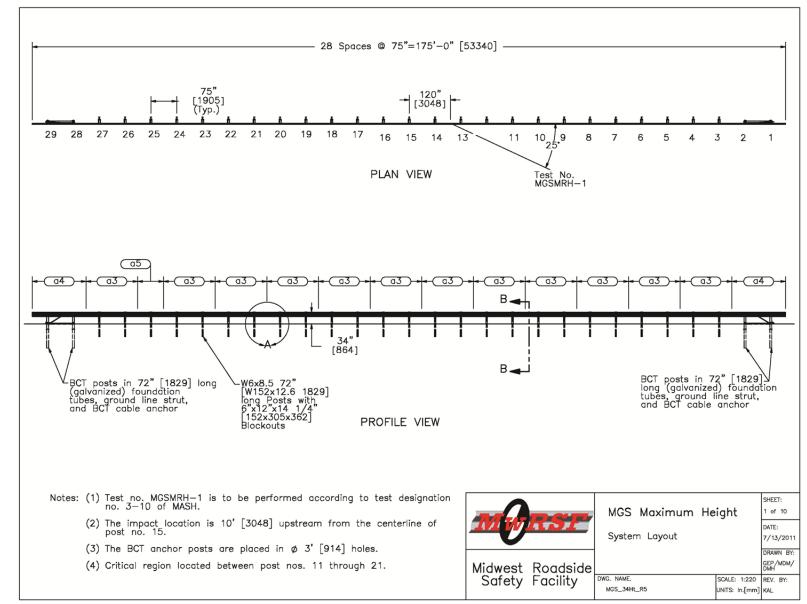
Test Installation Layout, Test No. MGSMRH-1
